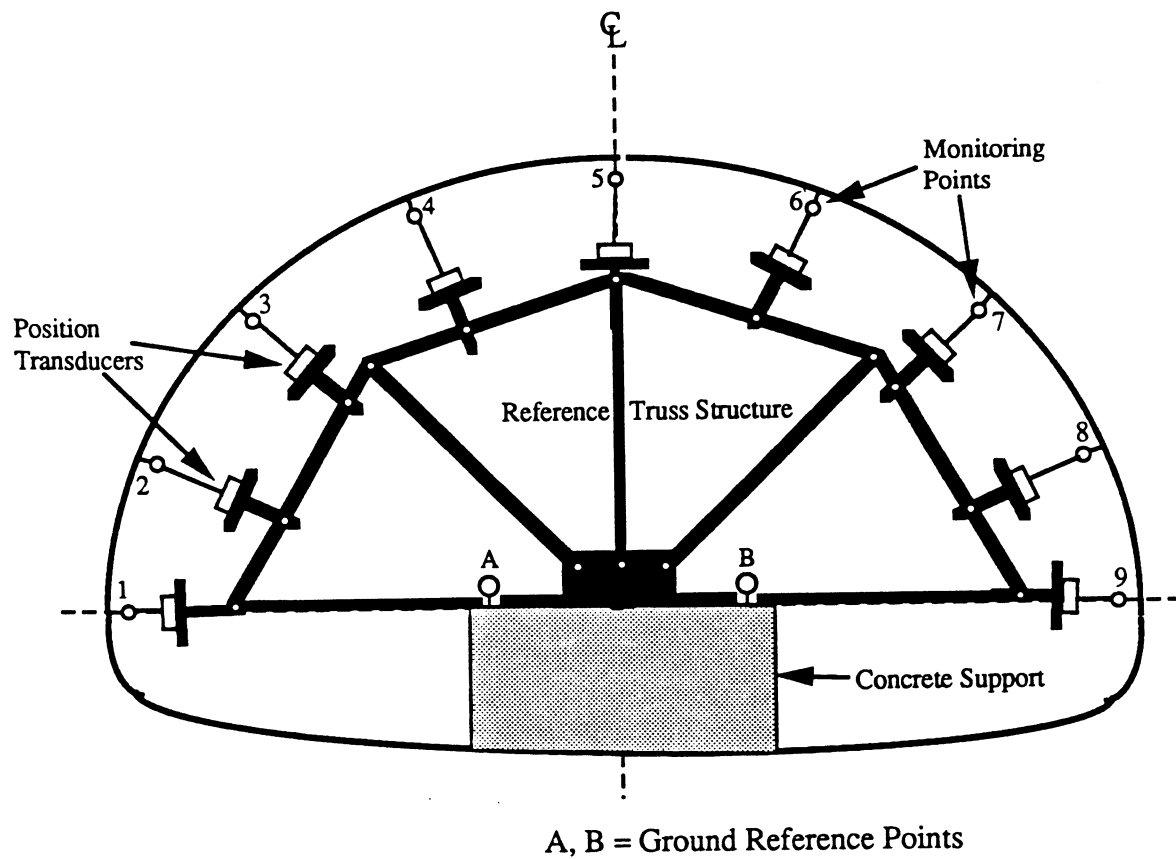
SYSTEM USED FOR CROSS-SECTIONAL SHAPE AND DEFLECTION MEASUREMENTS
